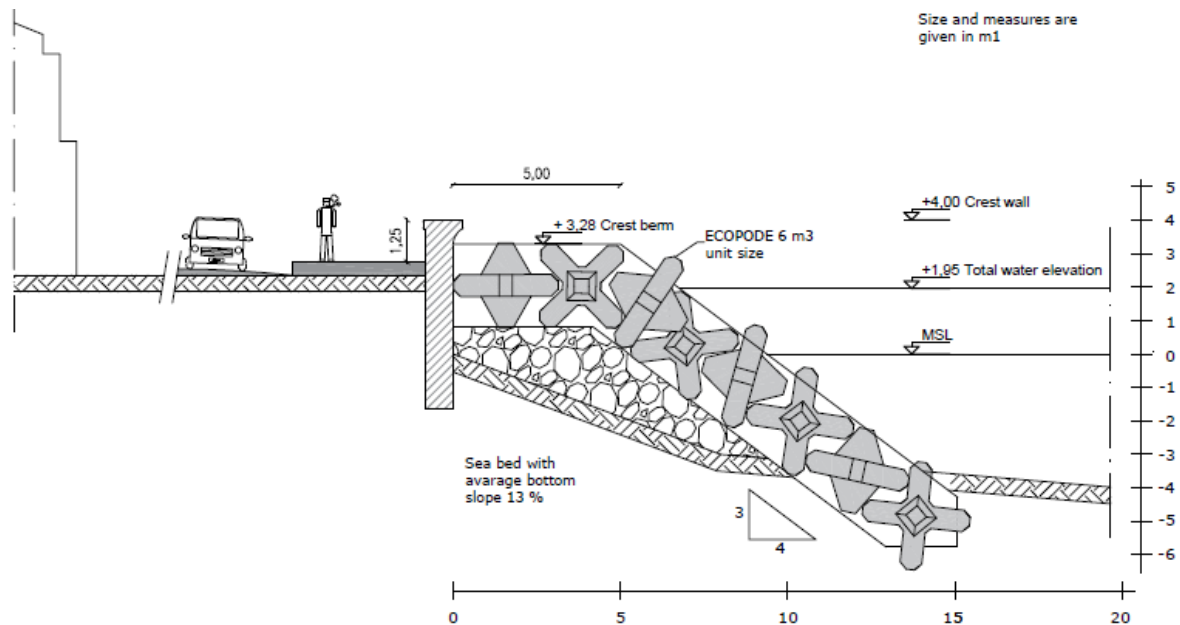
Detailed design for sections 3.5, 3.6 and 3.7
